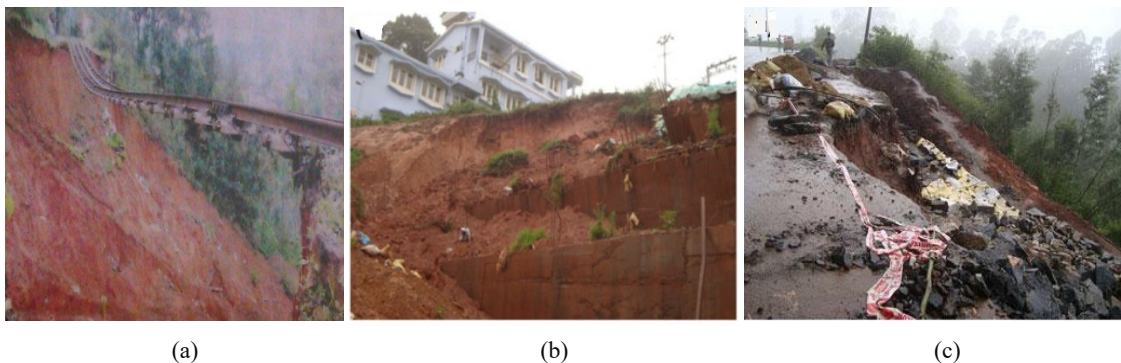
View of case history sites; (a) Slope failure at Aravankadu (b) Retaining wall failure at Coonoor (c) Slope failure at Chinnabikkatty (Chandrasekaran et al. 2013b)
